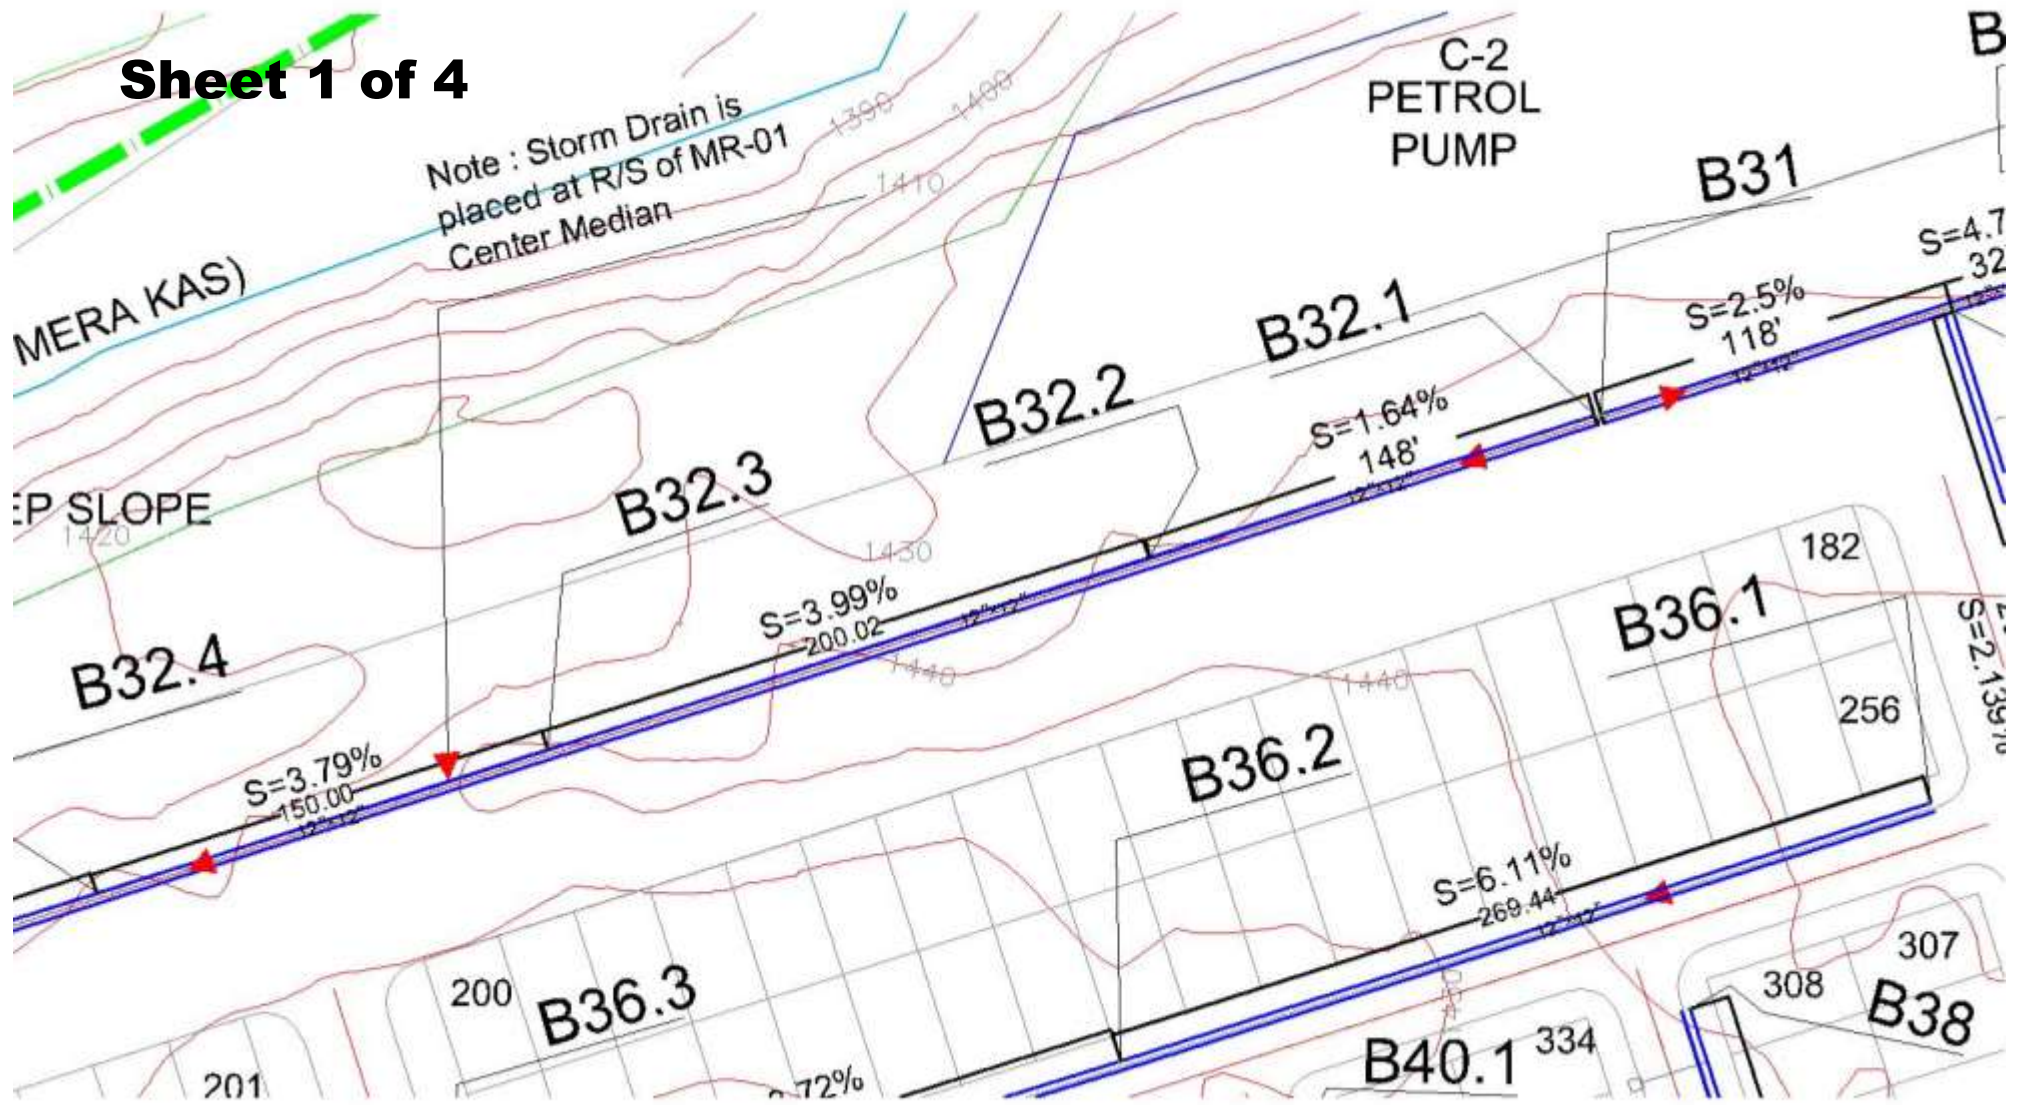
Storm drainage layout plan of Sub-catchment-5 showing initial nodes B36.1 & B32.1
